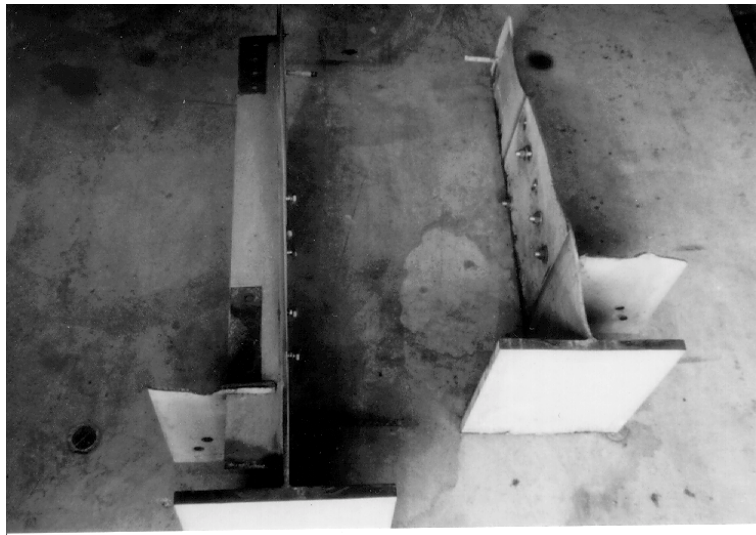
View of fracture surfaces after cutting fractured girder
